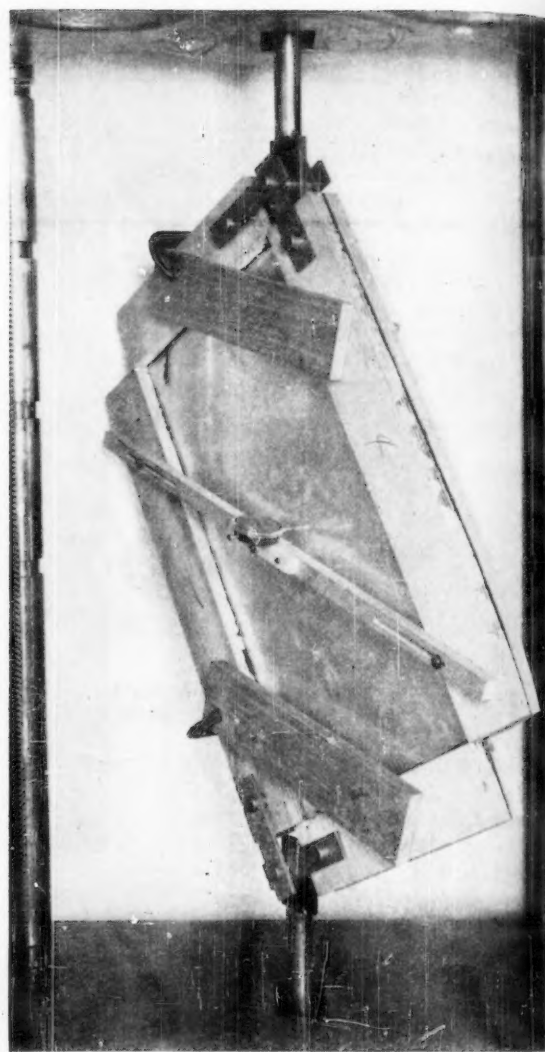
Test of a Panel of Sandwich Construction in Edgewise Shear.
